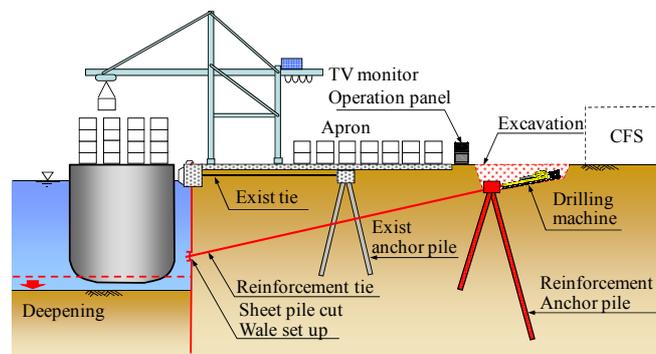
Conceptual drawing of the dual anchored sheet pile wall method (constructed by UGETS)
